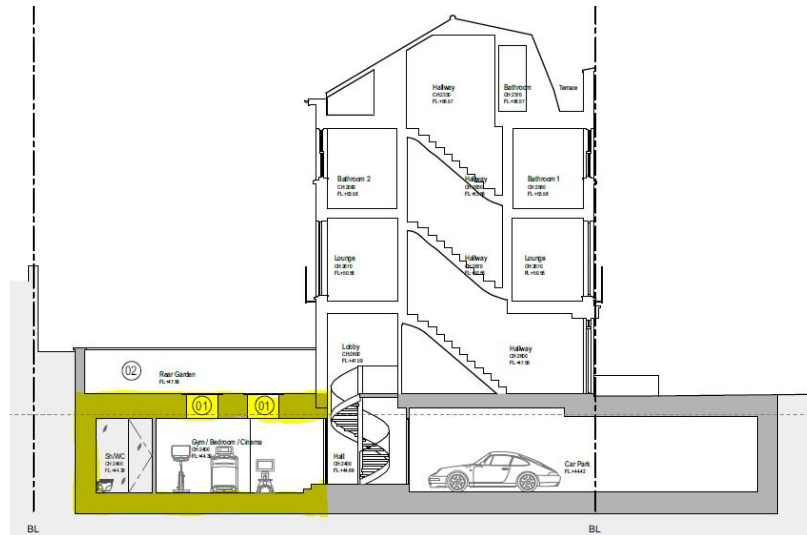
PROPOSED SECTION A-A (NEW BASEMENT HIGHLIGHTED)
